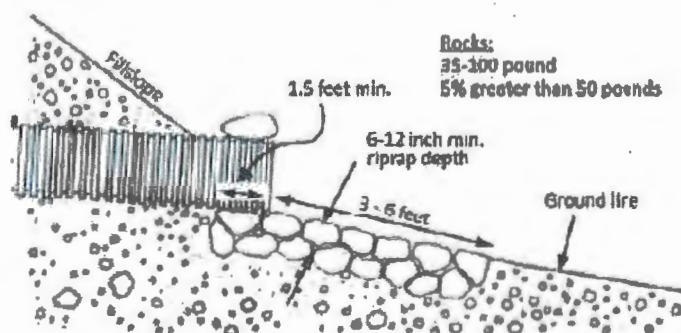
A. Riprap armor at culvert outlet (Modified from: Keller et al., 2011).
